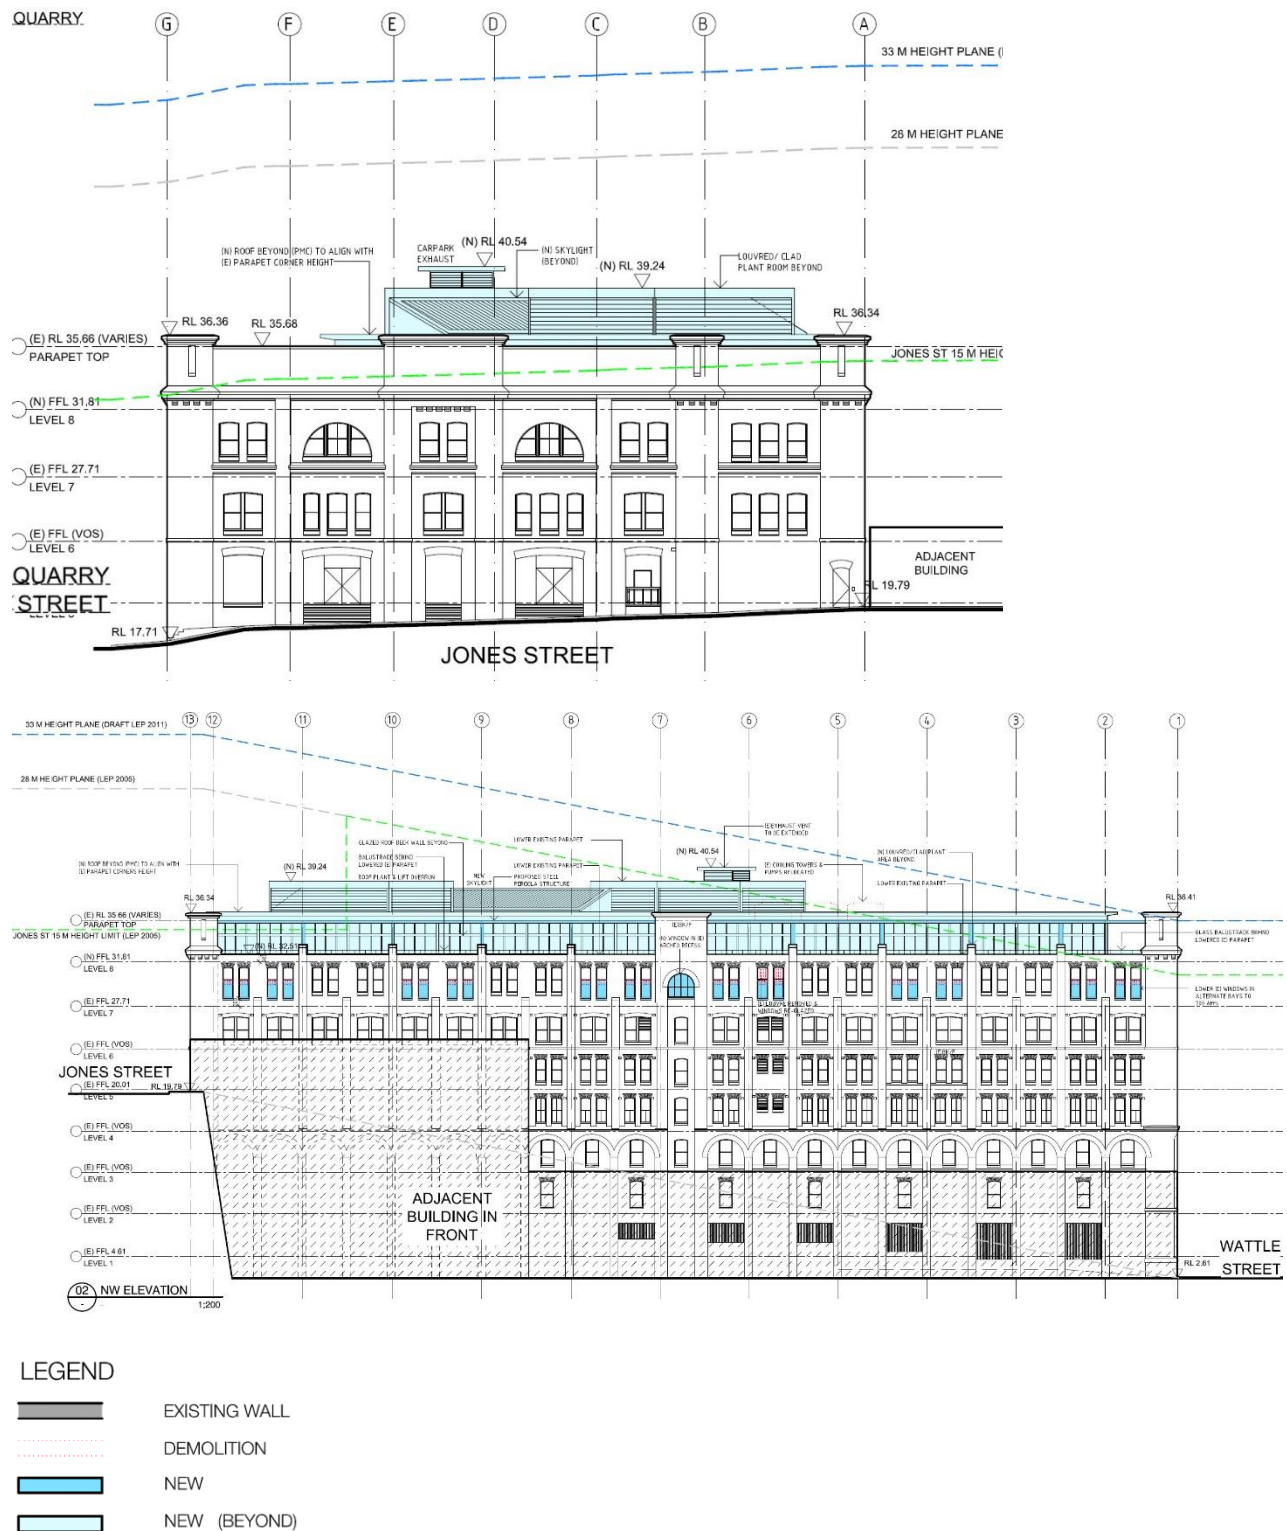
Jones and Quarry Street elevations of 45 Jones Street (aka 50-54 Wattle Street) showing approved addition (D/2011/2126/A)
